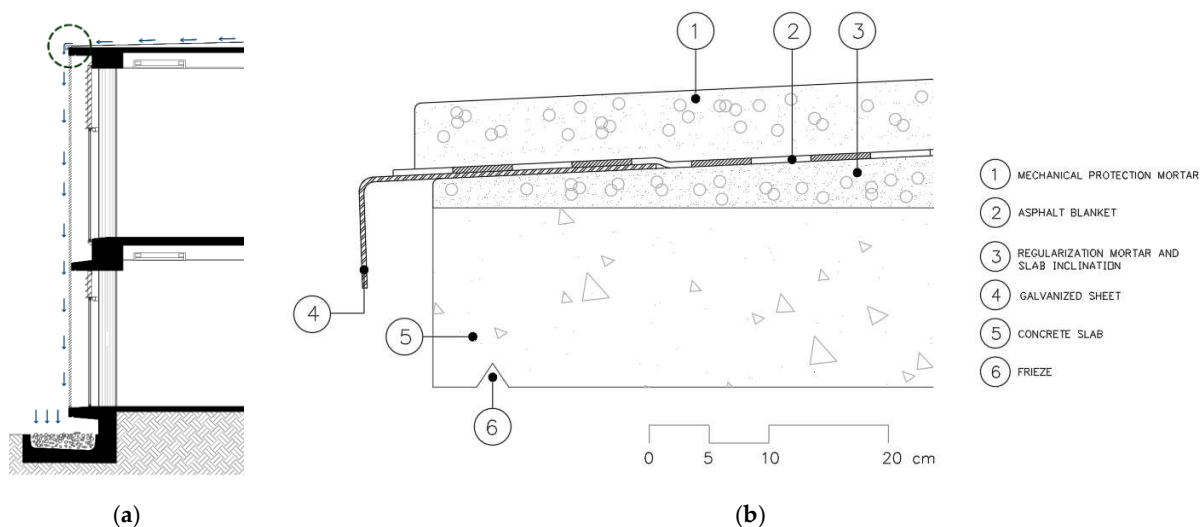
(a) Schematic section of the CDS/UnB: rainwater flow from the roof (highlighting the drip edges, (b)). Source: Oscar Niemeyer Planning Center—CEPLAN/UnB. (b) Built detailing of the CDS/UnB drip edges, made of galvanized steel sheets. Source: the authors.
